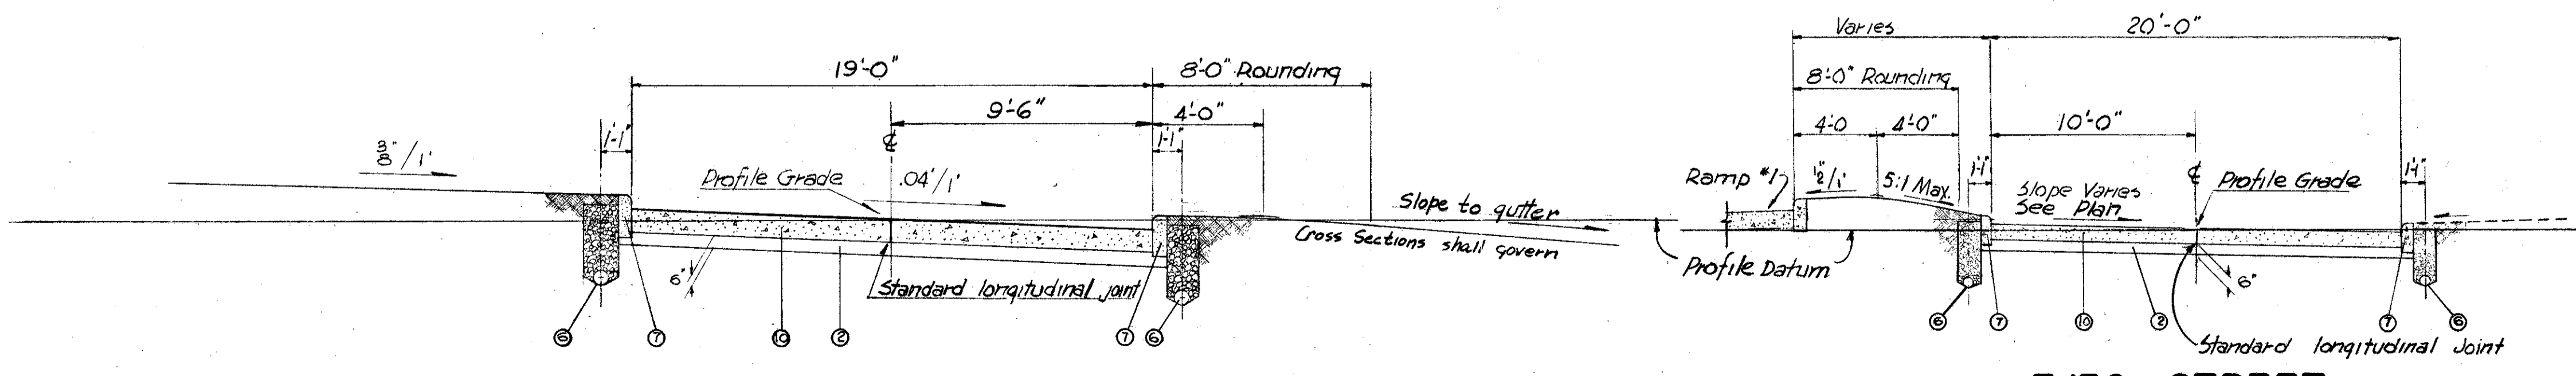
DETAIL OF CURBED SIDEWALK UNDER BRIDGES
